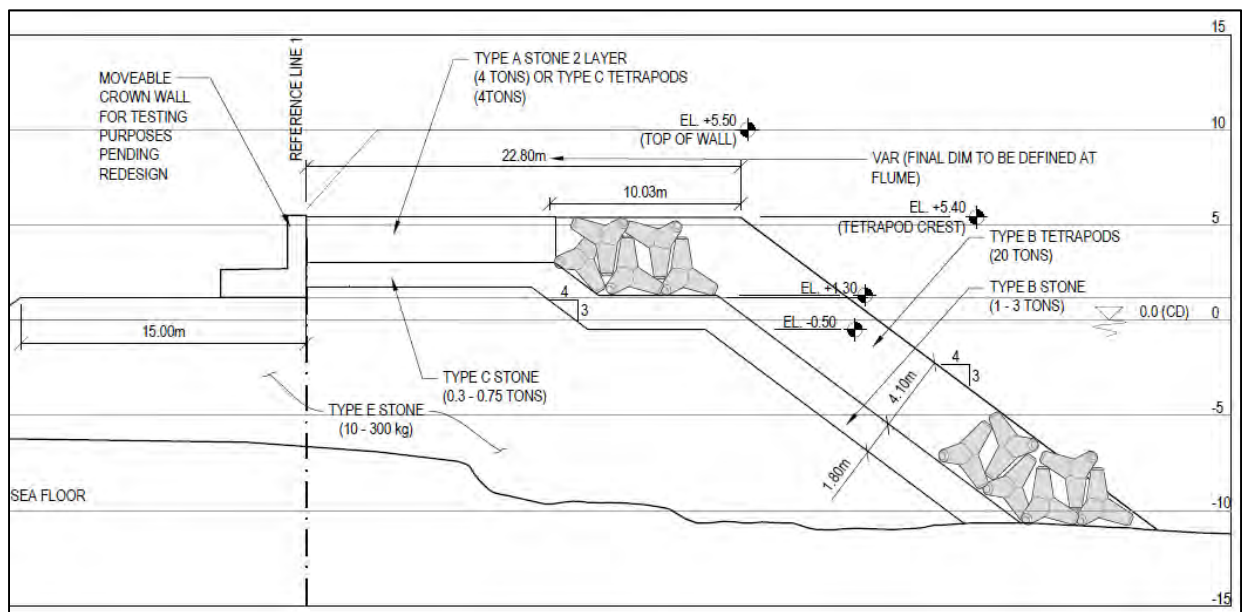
Preliminary Wide Berm Low Crest Breakwater Cross Section
